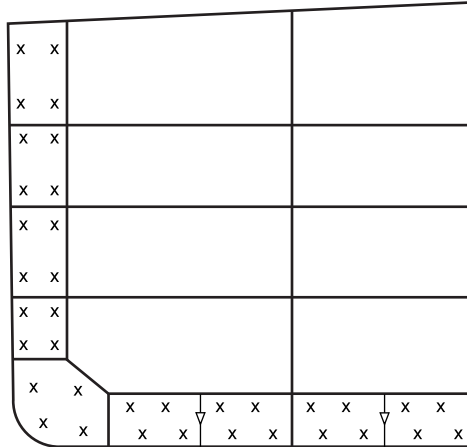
Typical location of measurement for pontoon normal transverse section of column-stabilized fish farm
